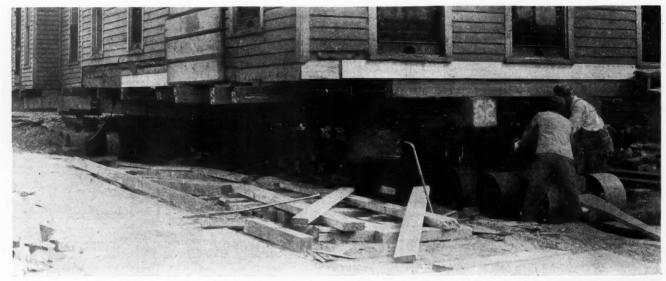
Running the Trucks and Tracking Out on an Incline. This Plan Saves Time and Money in Shortening the Distance That the Building Has to be Raised. In This Instance Two Feet Were Saved in Raising the Building Which Amounts to a Day's Work.
